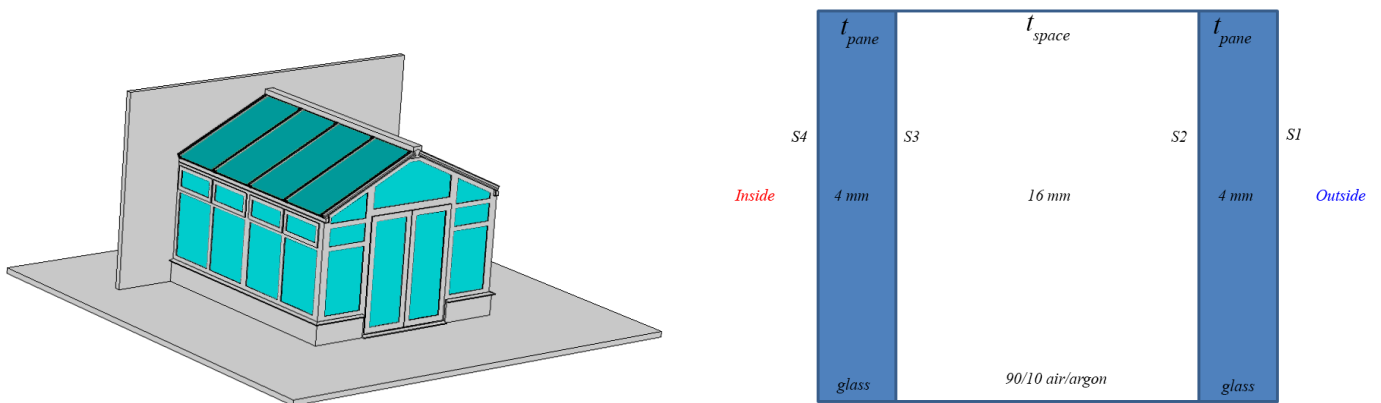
Case 3 conservatory installation with SunGuard HP 50/32 to roof and SunGuard HP 60/40 to walls.
